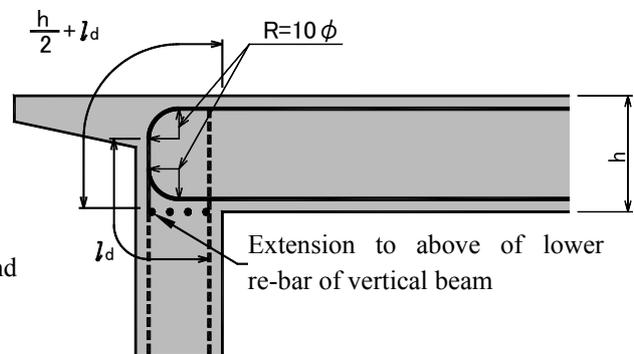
Arrangement of primary reinforcement in the lower part of the cantilever slab<sup>1)</sup>
